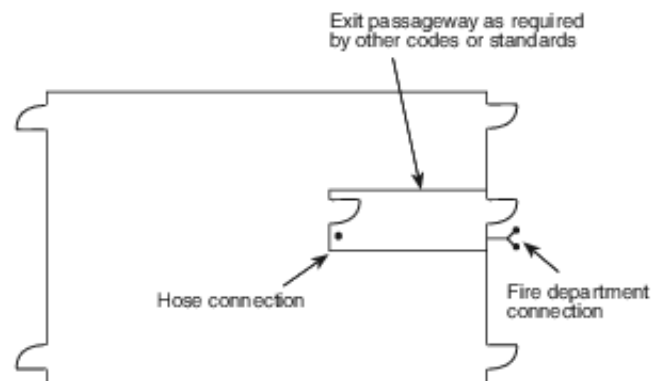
(c) Location of hose connections in exit passageways.
